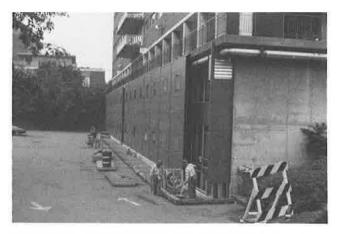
Modular sound wall affixed to exterior of Rutgers University building.
